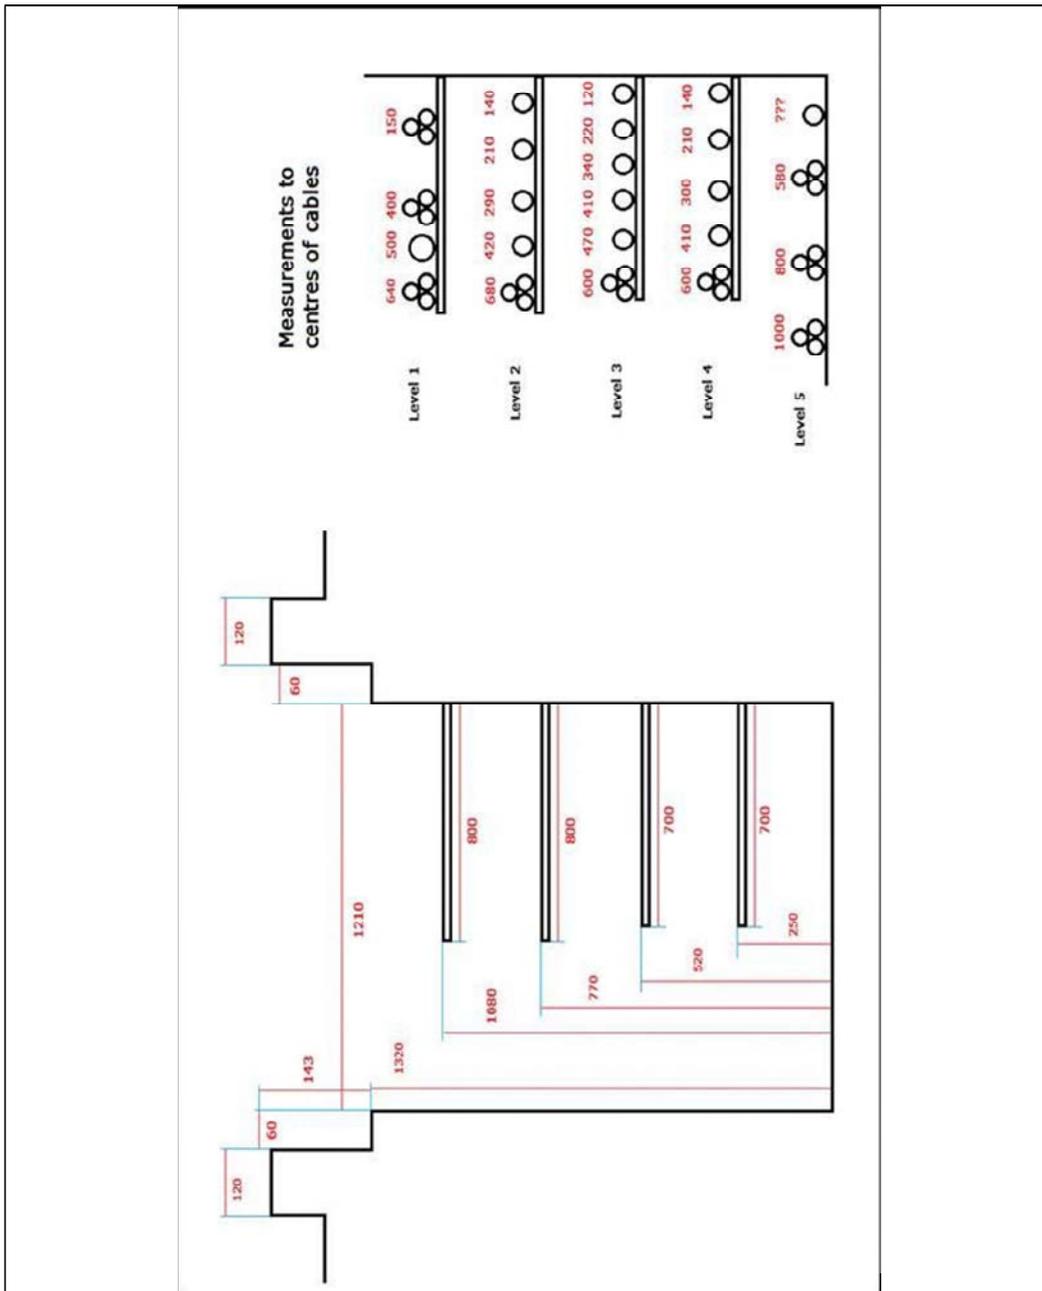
Trench dimensions and cable centre-line spacings at 65 m
